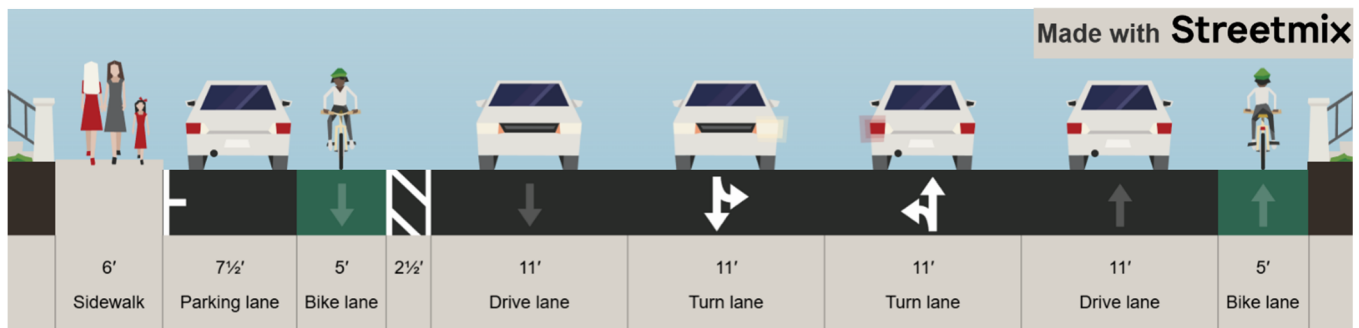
Existing cross section of Moraga Road from Corliss Dr to Donald Dr. Created using Streetmix (<https://streetmix.net>).
